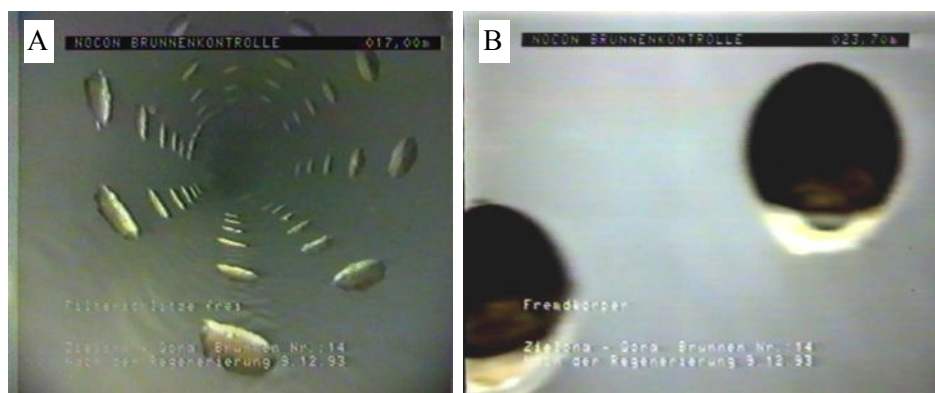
Exemplary view of well inside showing out filter zone after regeneration:
